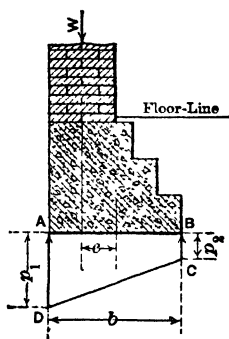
Offset Footing. Varying Pressure on Foundation-bed
